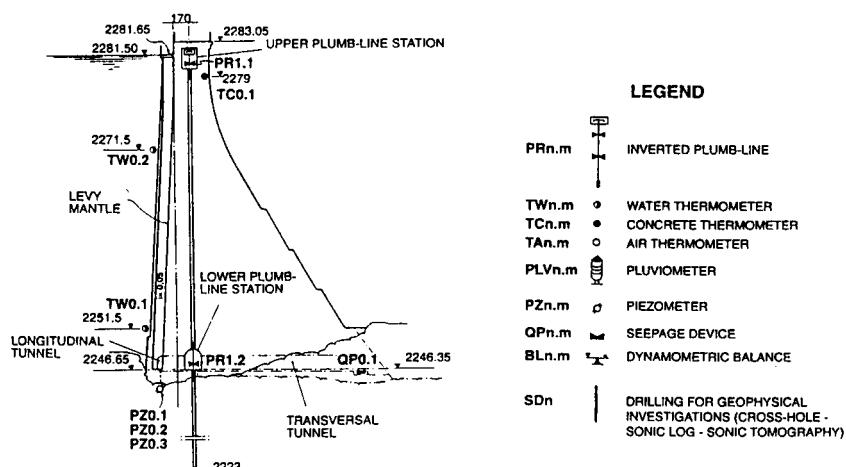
BAITONE DAM MONITORING SYSTEM
